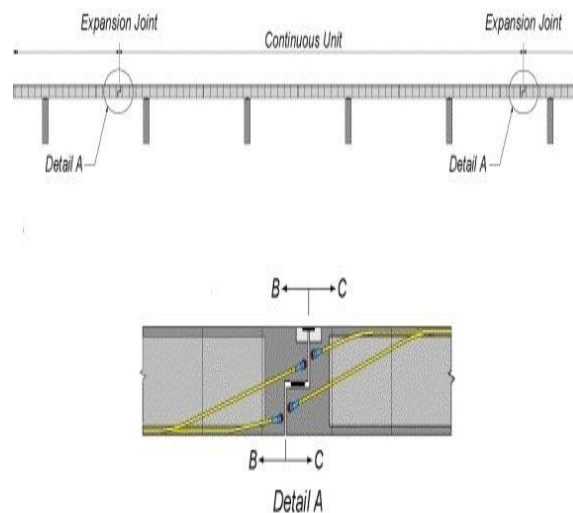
In-Span Hinges in Balanced Cantilever Construction
